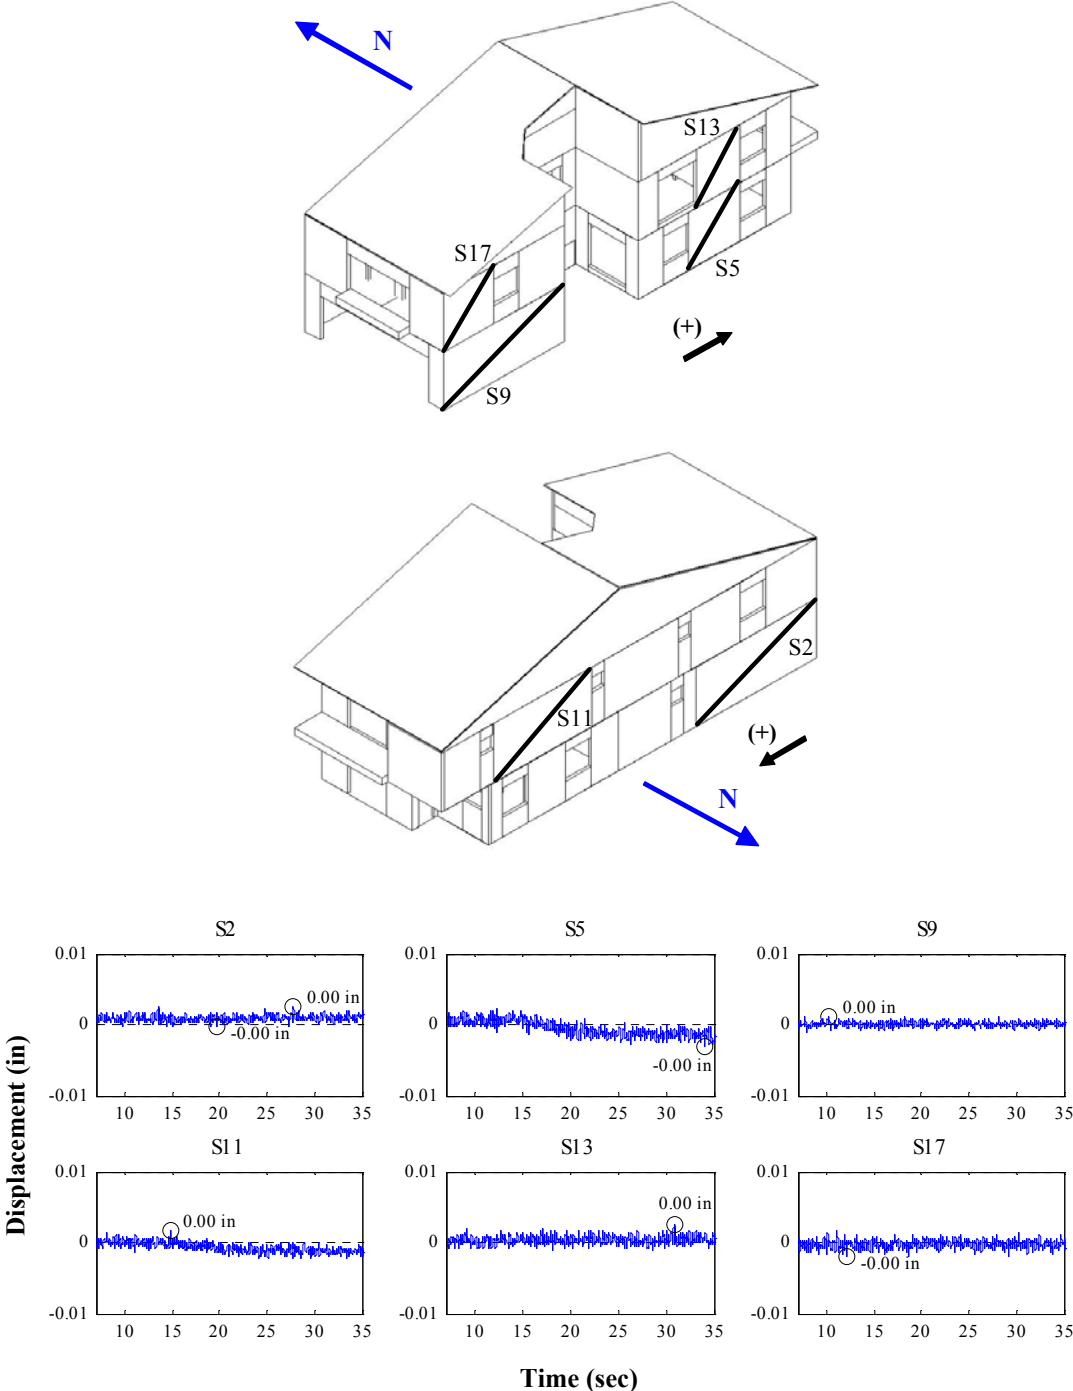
Wall deformations of east-west external walls for Test NWP3S01
